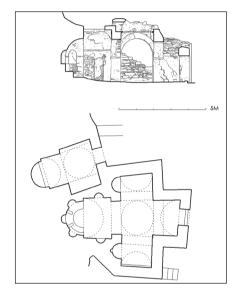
Stavros at Kakavas. Plan and longitudinal section.
